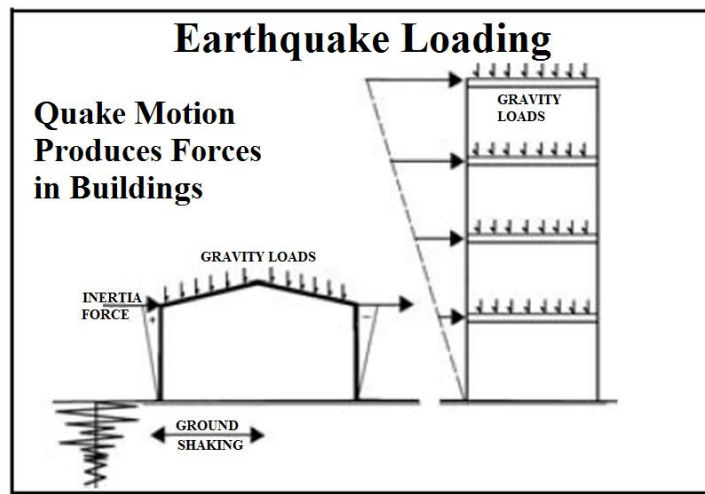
Shows the horizontal and vertical forces that can cause building collapse [79].
